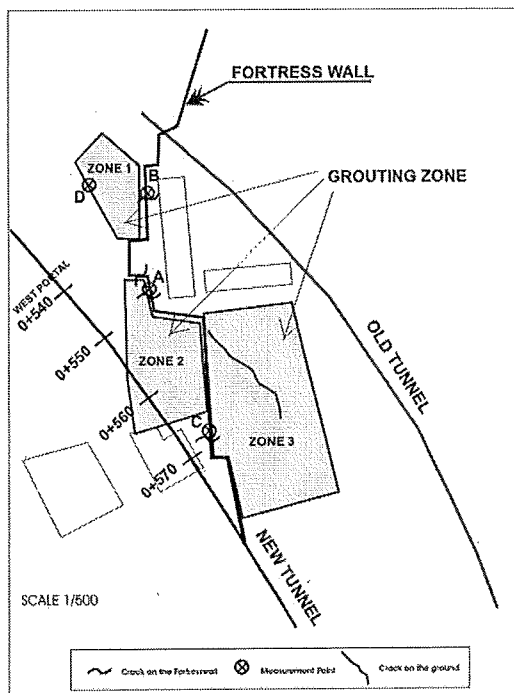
Plan view from west portal area showing measuring points, cracks and grouting areas.
